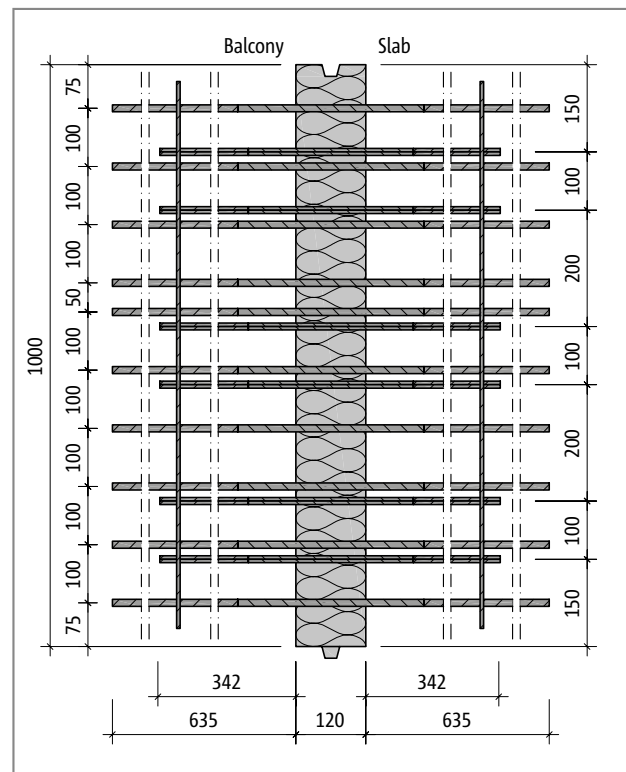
Schöck Isokorb® XT type D-MM4-VV1: Plan view
